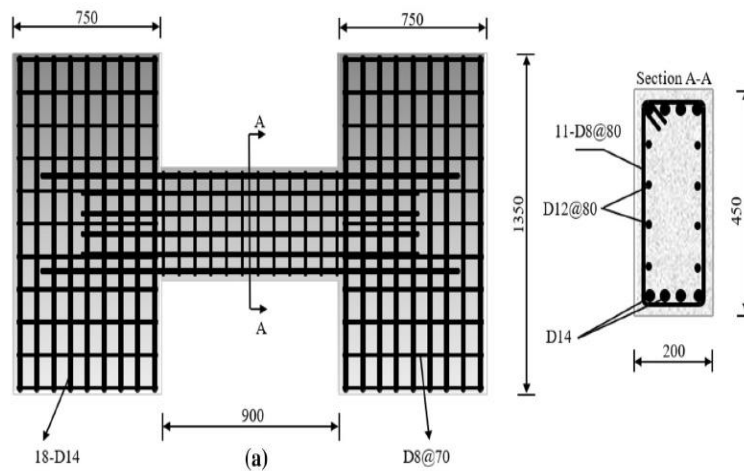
DIMENSIONS AND REINFORCEMENT DETAILS OF CONVENTIONALLY REINFORCED COUPLING BEAM SPECIMEN: (CRCCB)(SES LI & HUSEM, 2021).
